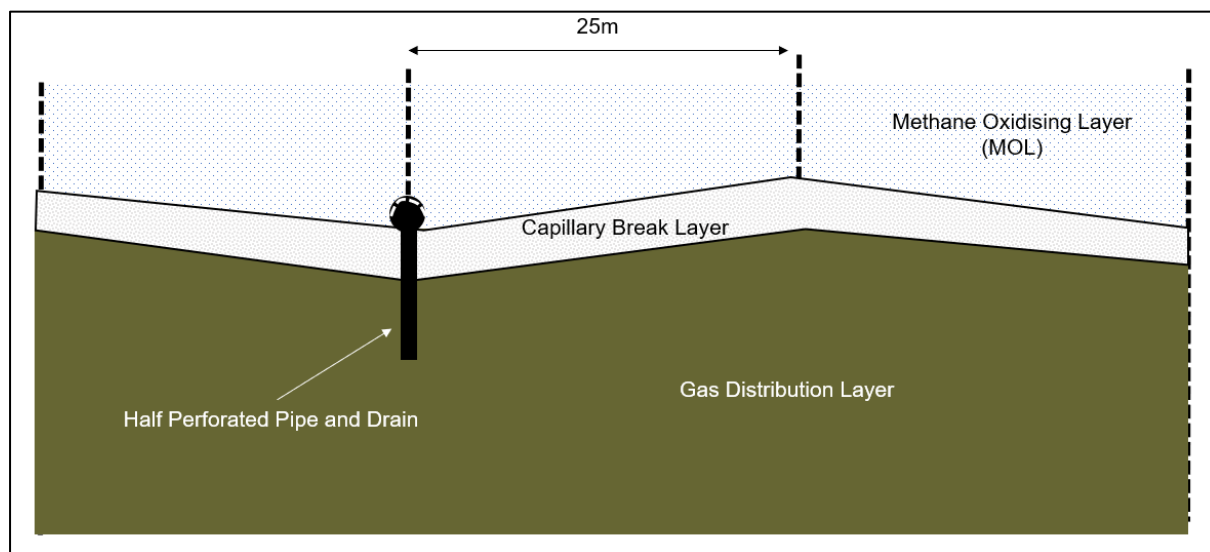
Design of Bioactive Trench – View on Long Section of Trench Showing Zig-Zag Capillary Break Layer.
